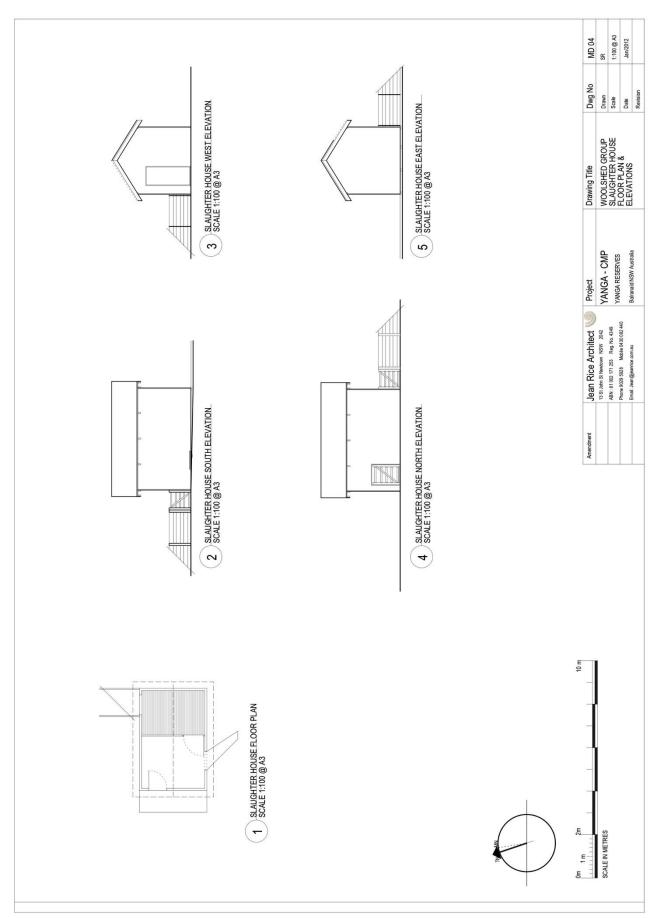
Woolshed Group Slaughterhouse floor plans and elevations. Jean Rice Architect, site assessed 2009.
